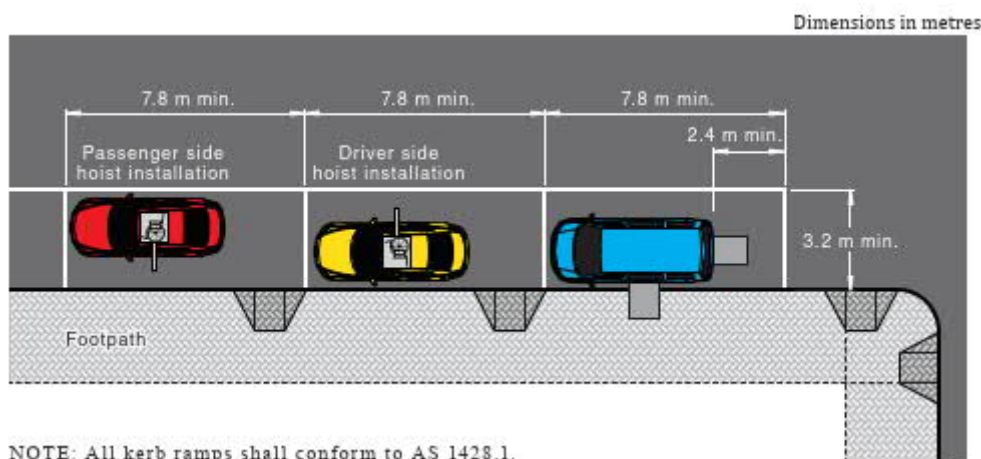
Parallel Accessibility Parking Space Layout (AS/NZS 2890.5)
